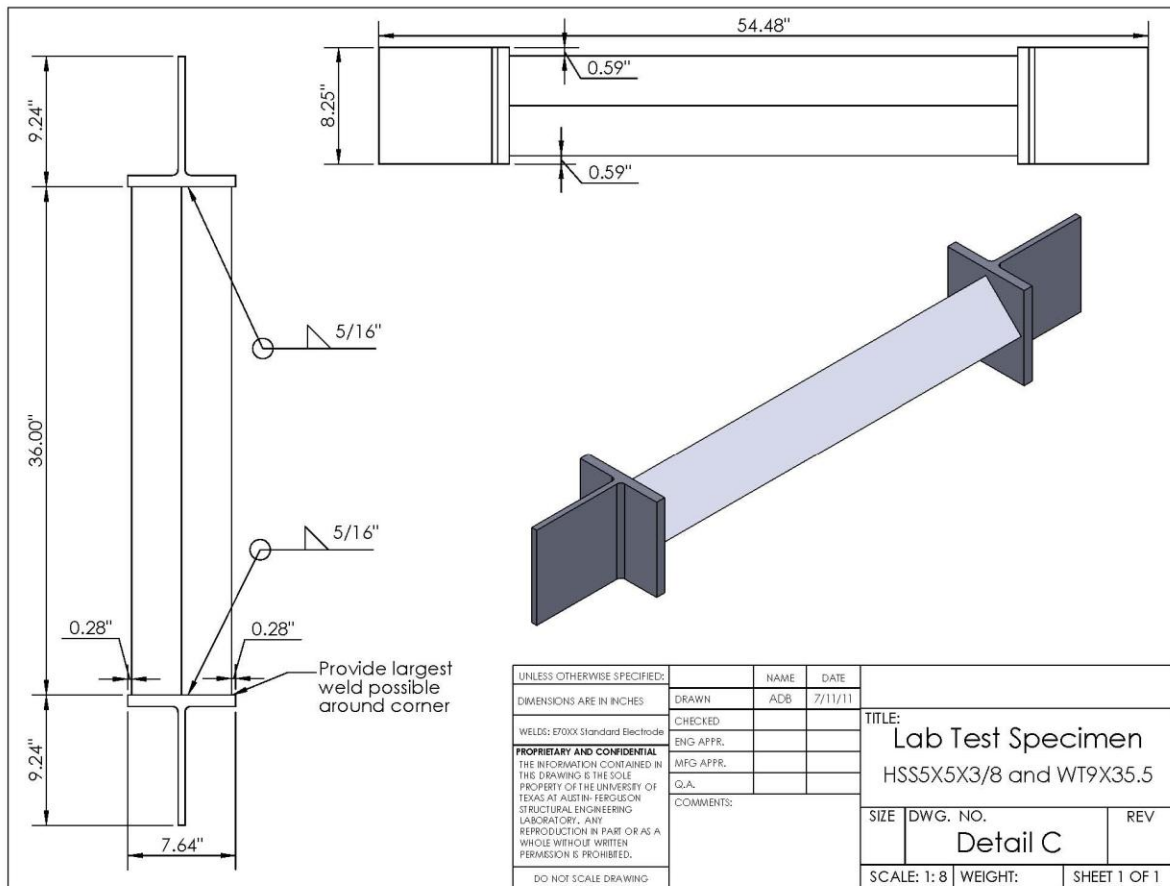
Diamond HSS Specimen with T-Stem Connection Detail
